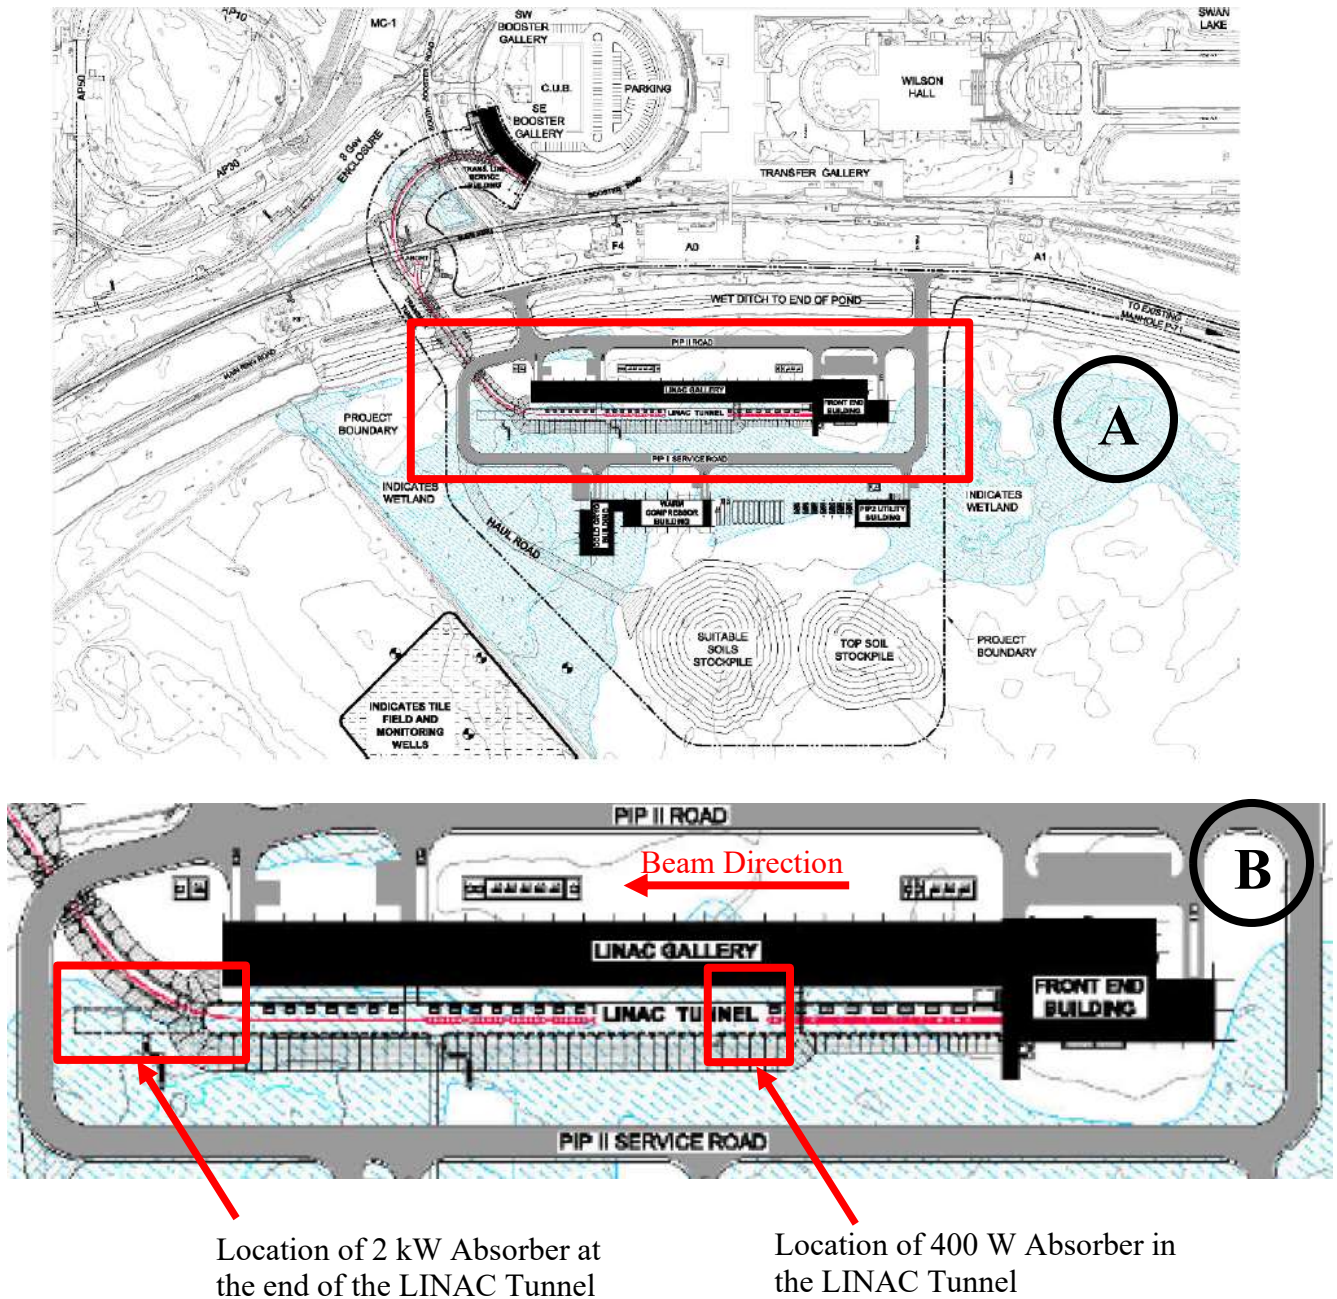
Site Layout of PIP-II, A: Overall Layout and B: Enlarged View.
